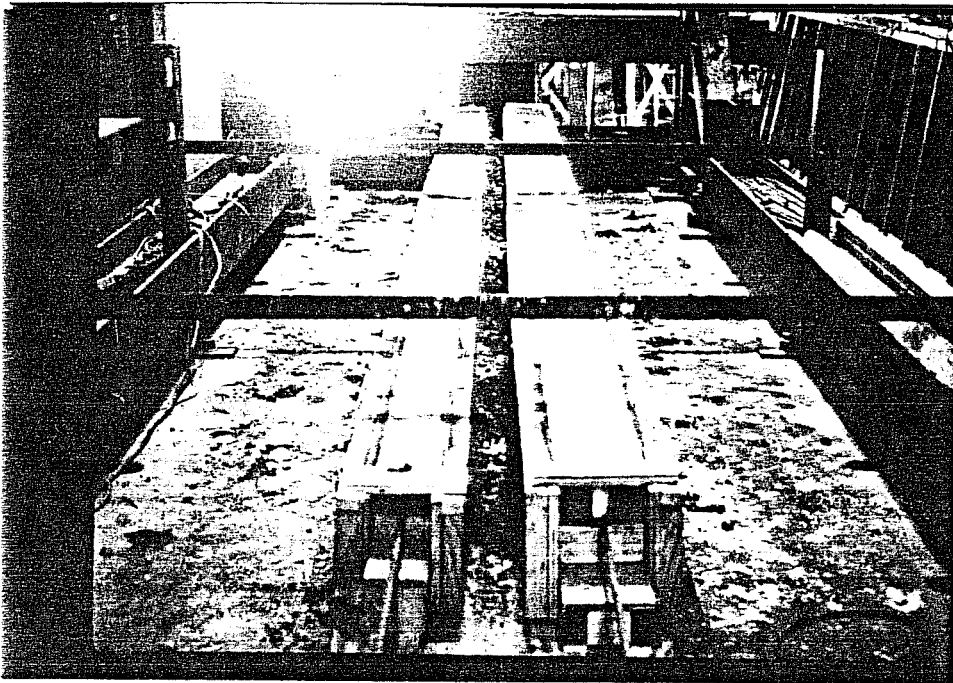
Photograph of specimens in prestressing bed after placement of concrete
